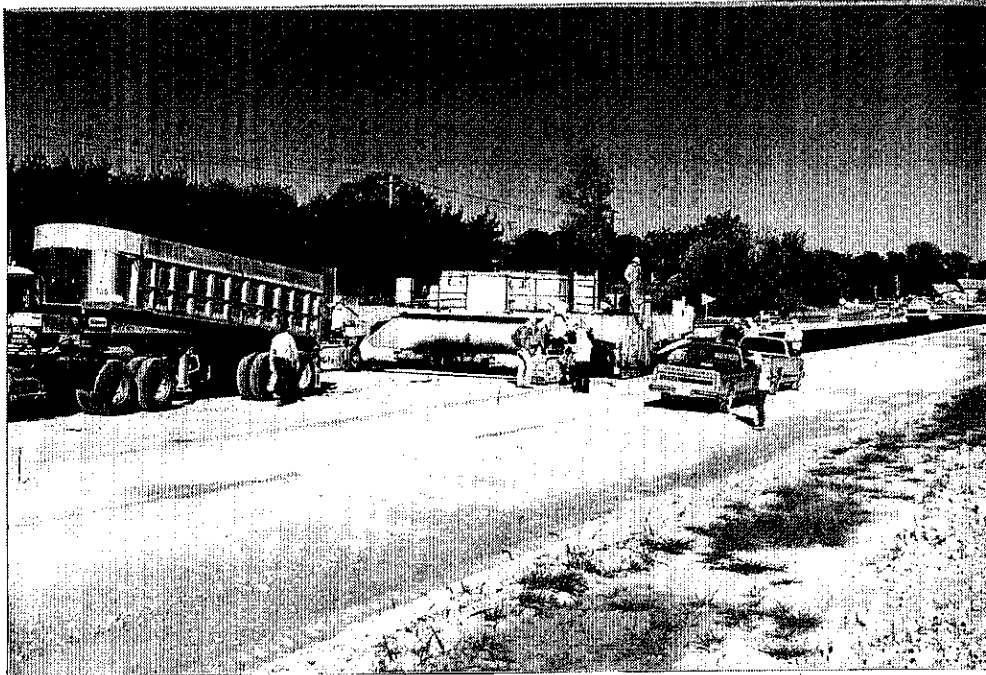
Modified autograde used to place the Belleville demonstration project drainage layer.
